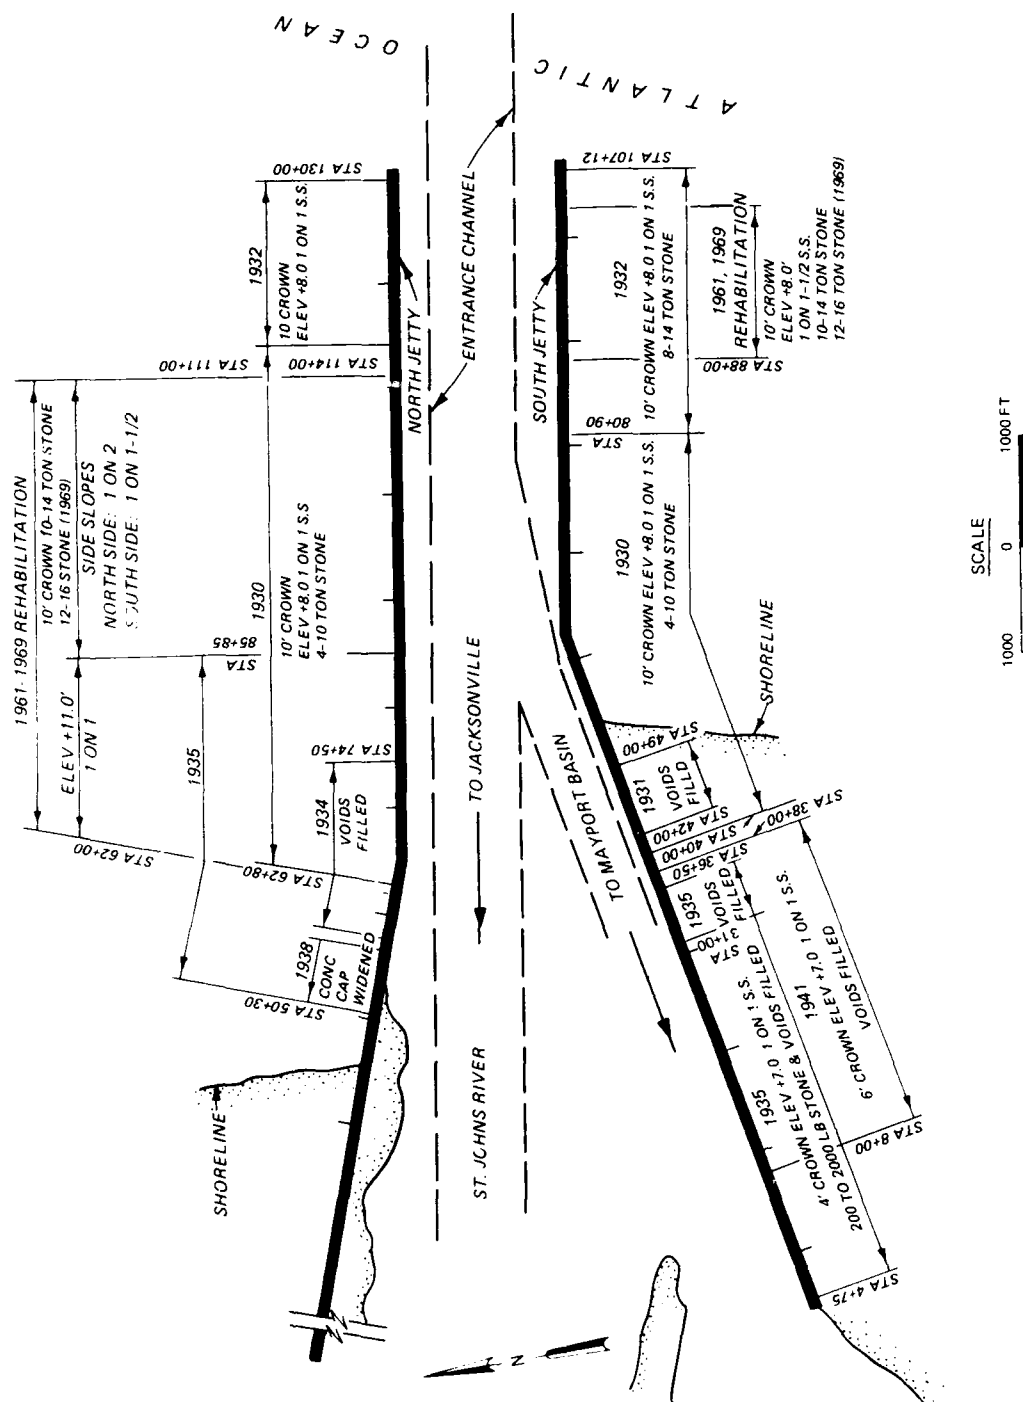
Plan view of cumulative repairs to Jacksonville jetties from 1930 to 1969
